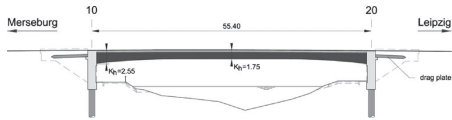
Sketch of a German bridge with reinforced cast-in-place concrete piles (SSF Ingenieure, Germany, with permission)
